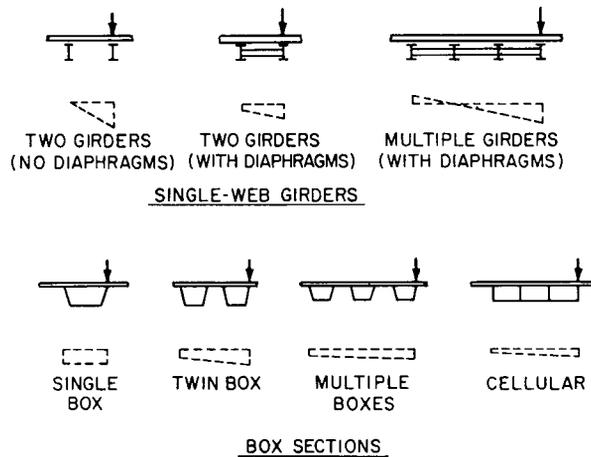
Comparison of lateral load distribution for single-web girders and box girders.
